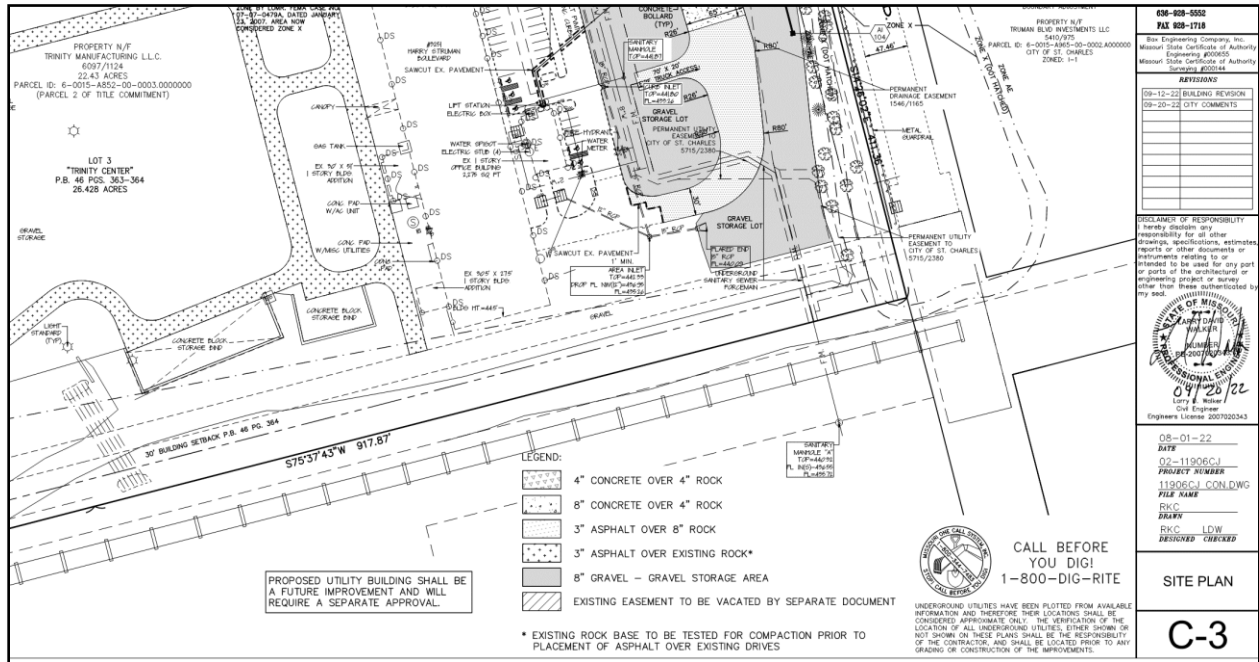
Screenshot of the approved Improvement Plans for 3251 Harry S Truman Blvd.
